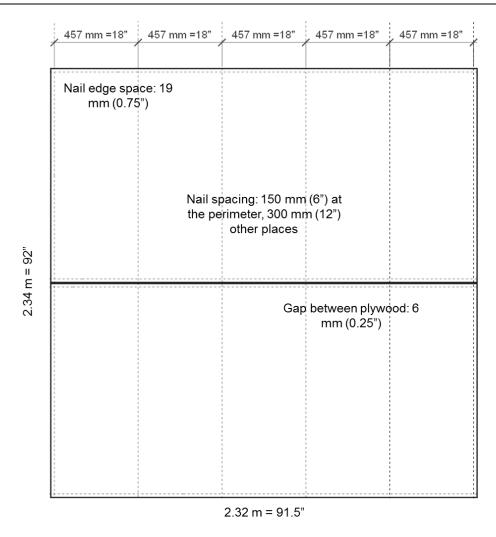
Nailing pattern for plywood sheathing (dotted lines)
